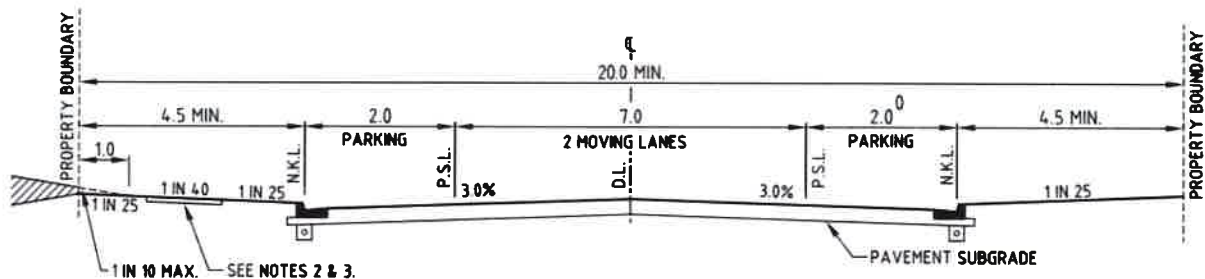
Proposed Internal Road Cross-Section (20m Road Reserve)
